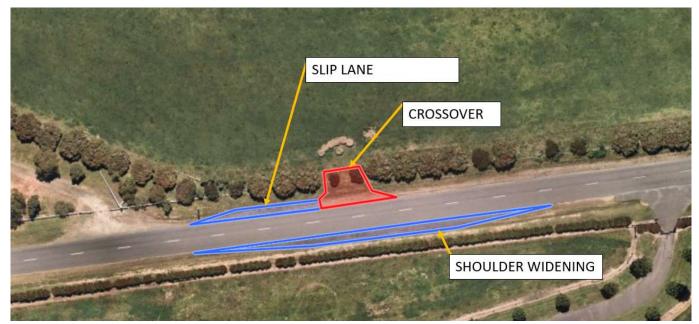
Likely roadworks at proposed Old Healesville Road entry
